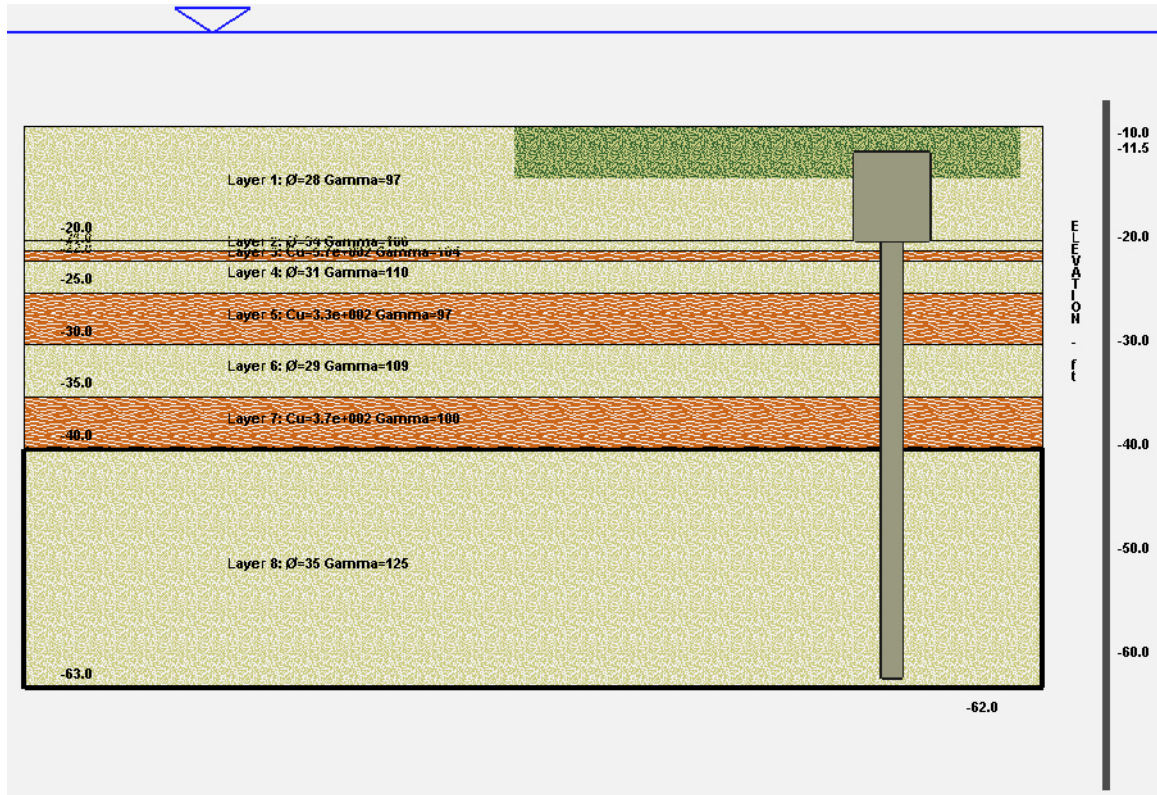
Pier 1S Soil Profile-FB-Pier
